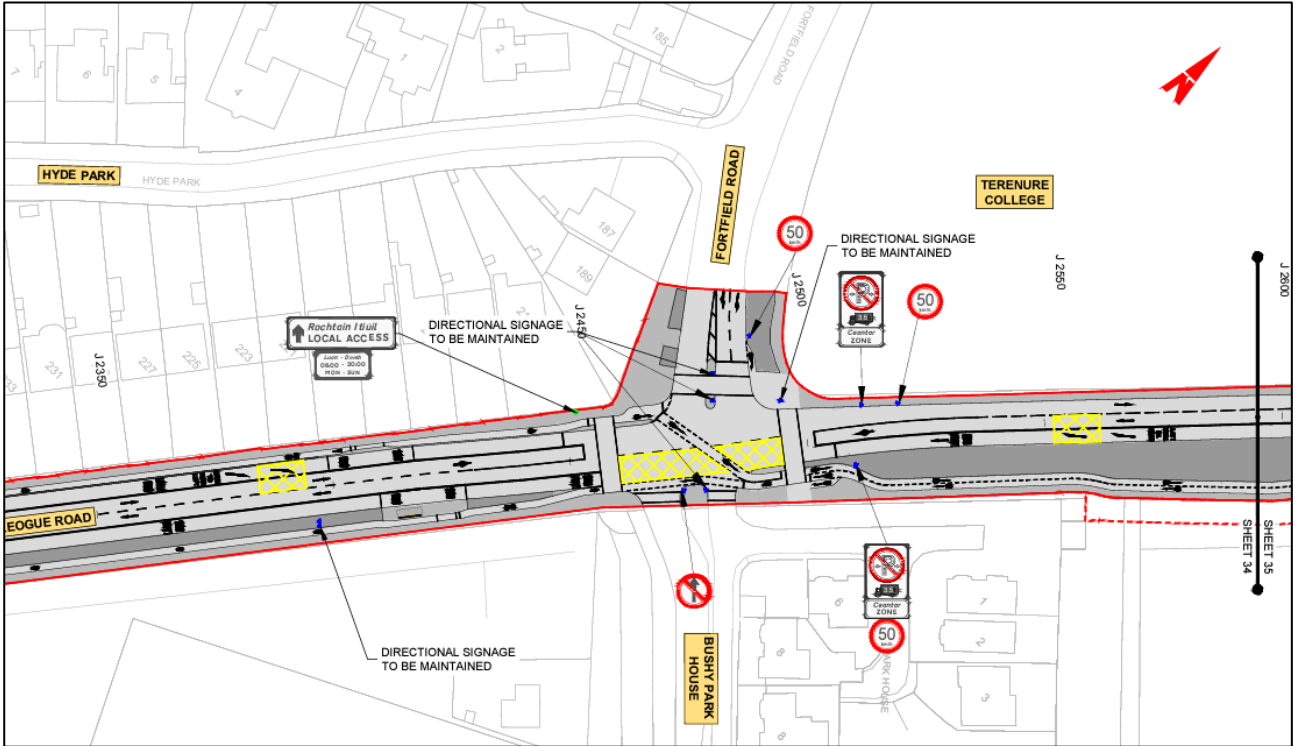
Extract from Traffic Signs and Road Markings Drawings (Sheet 34)
